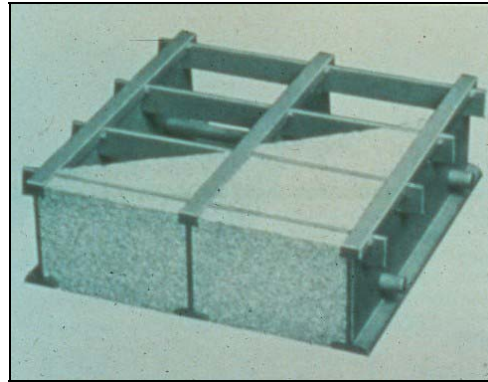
Schematic of Concrete Filled Grid Deck
